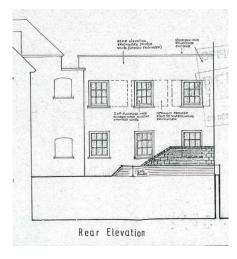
Plan from refused application 92/1029 showing proposed new window openings with painting over existing brickwork © Planning Portal
